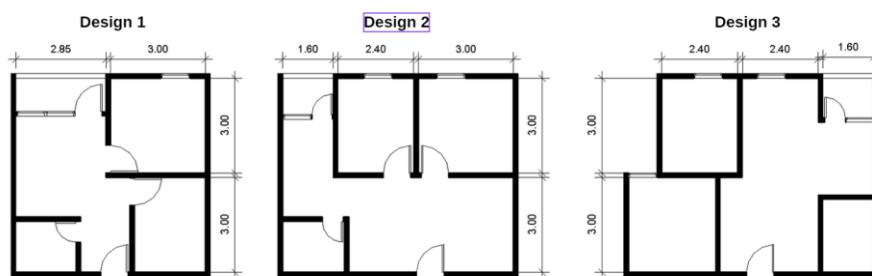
Space configuration (layout plan) of the low-cost apartment unit
